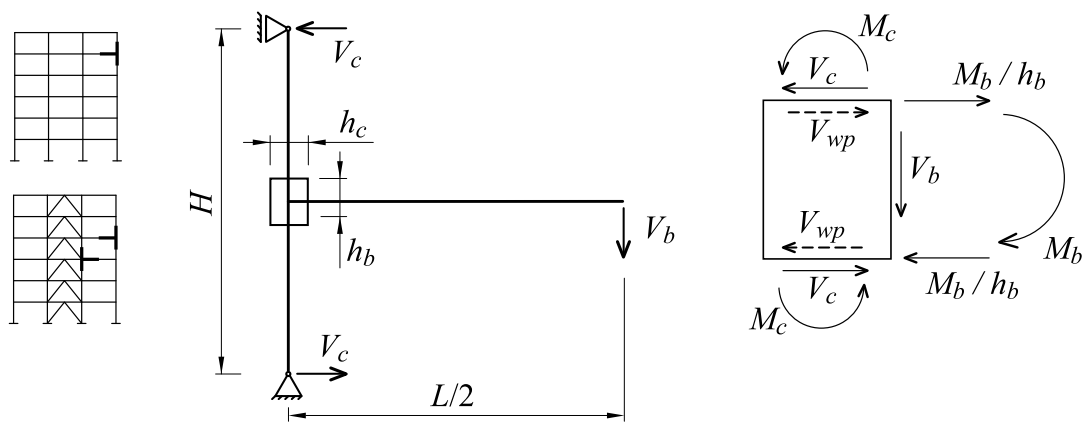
Sample frame with single-sided joint configuration, internal forces in panel zone
